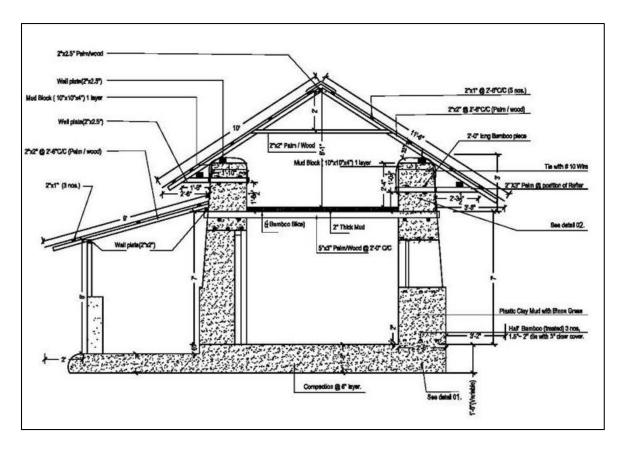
Section of the constructed improved mud house in Porsha, Naogaon
